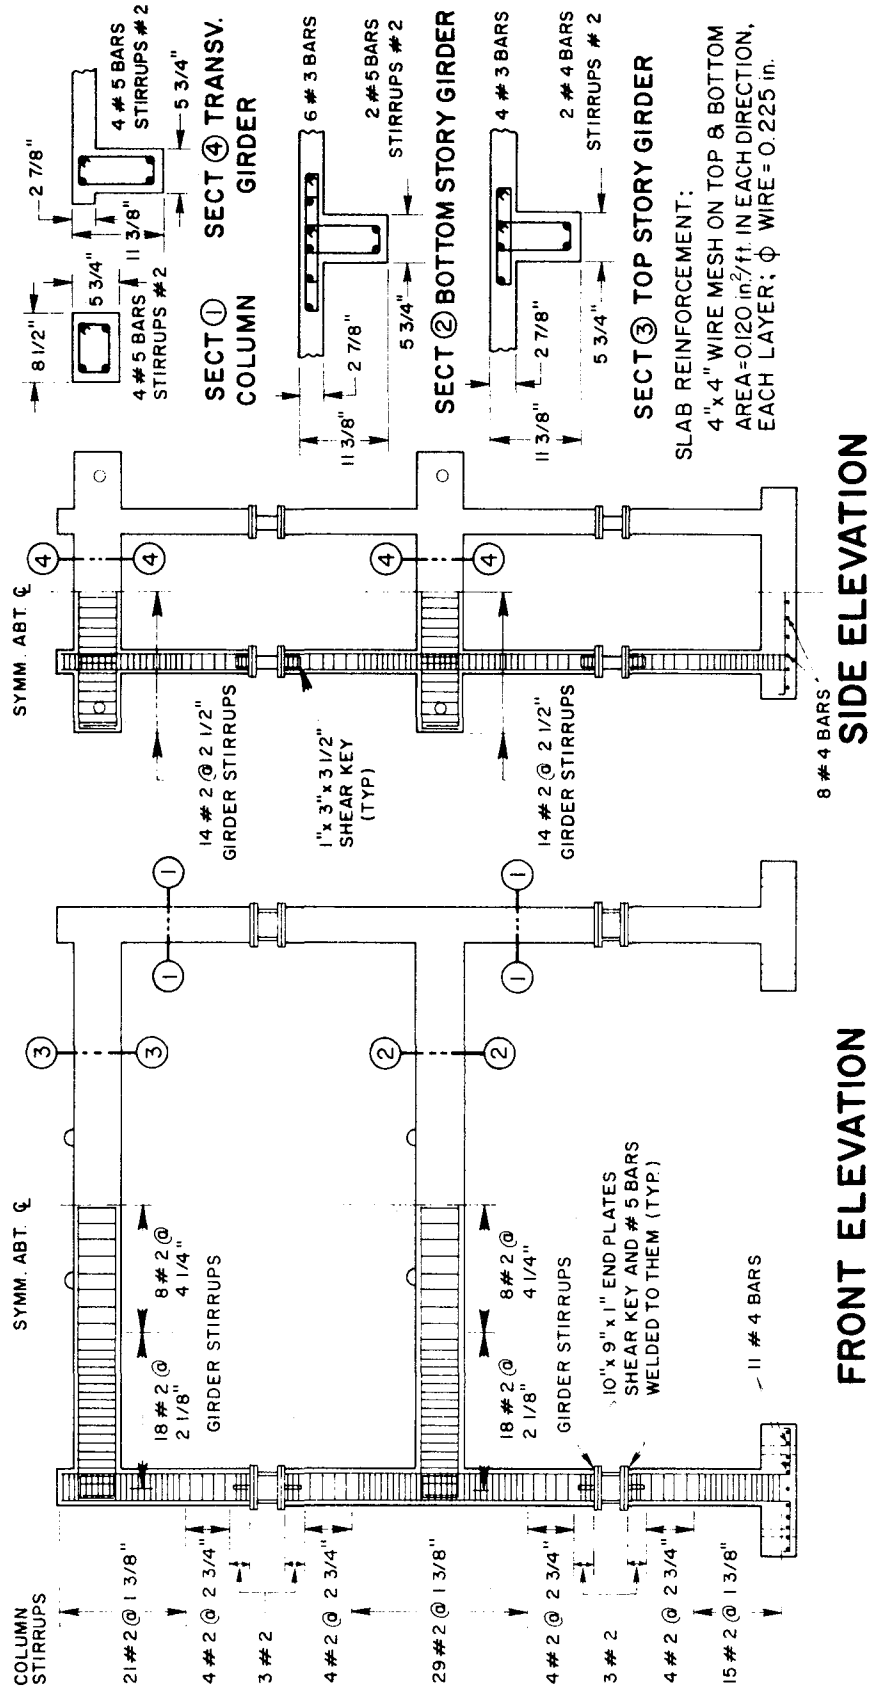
TEST STRUCTURE - DETAILS OF REINFORCEMENT.
